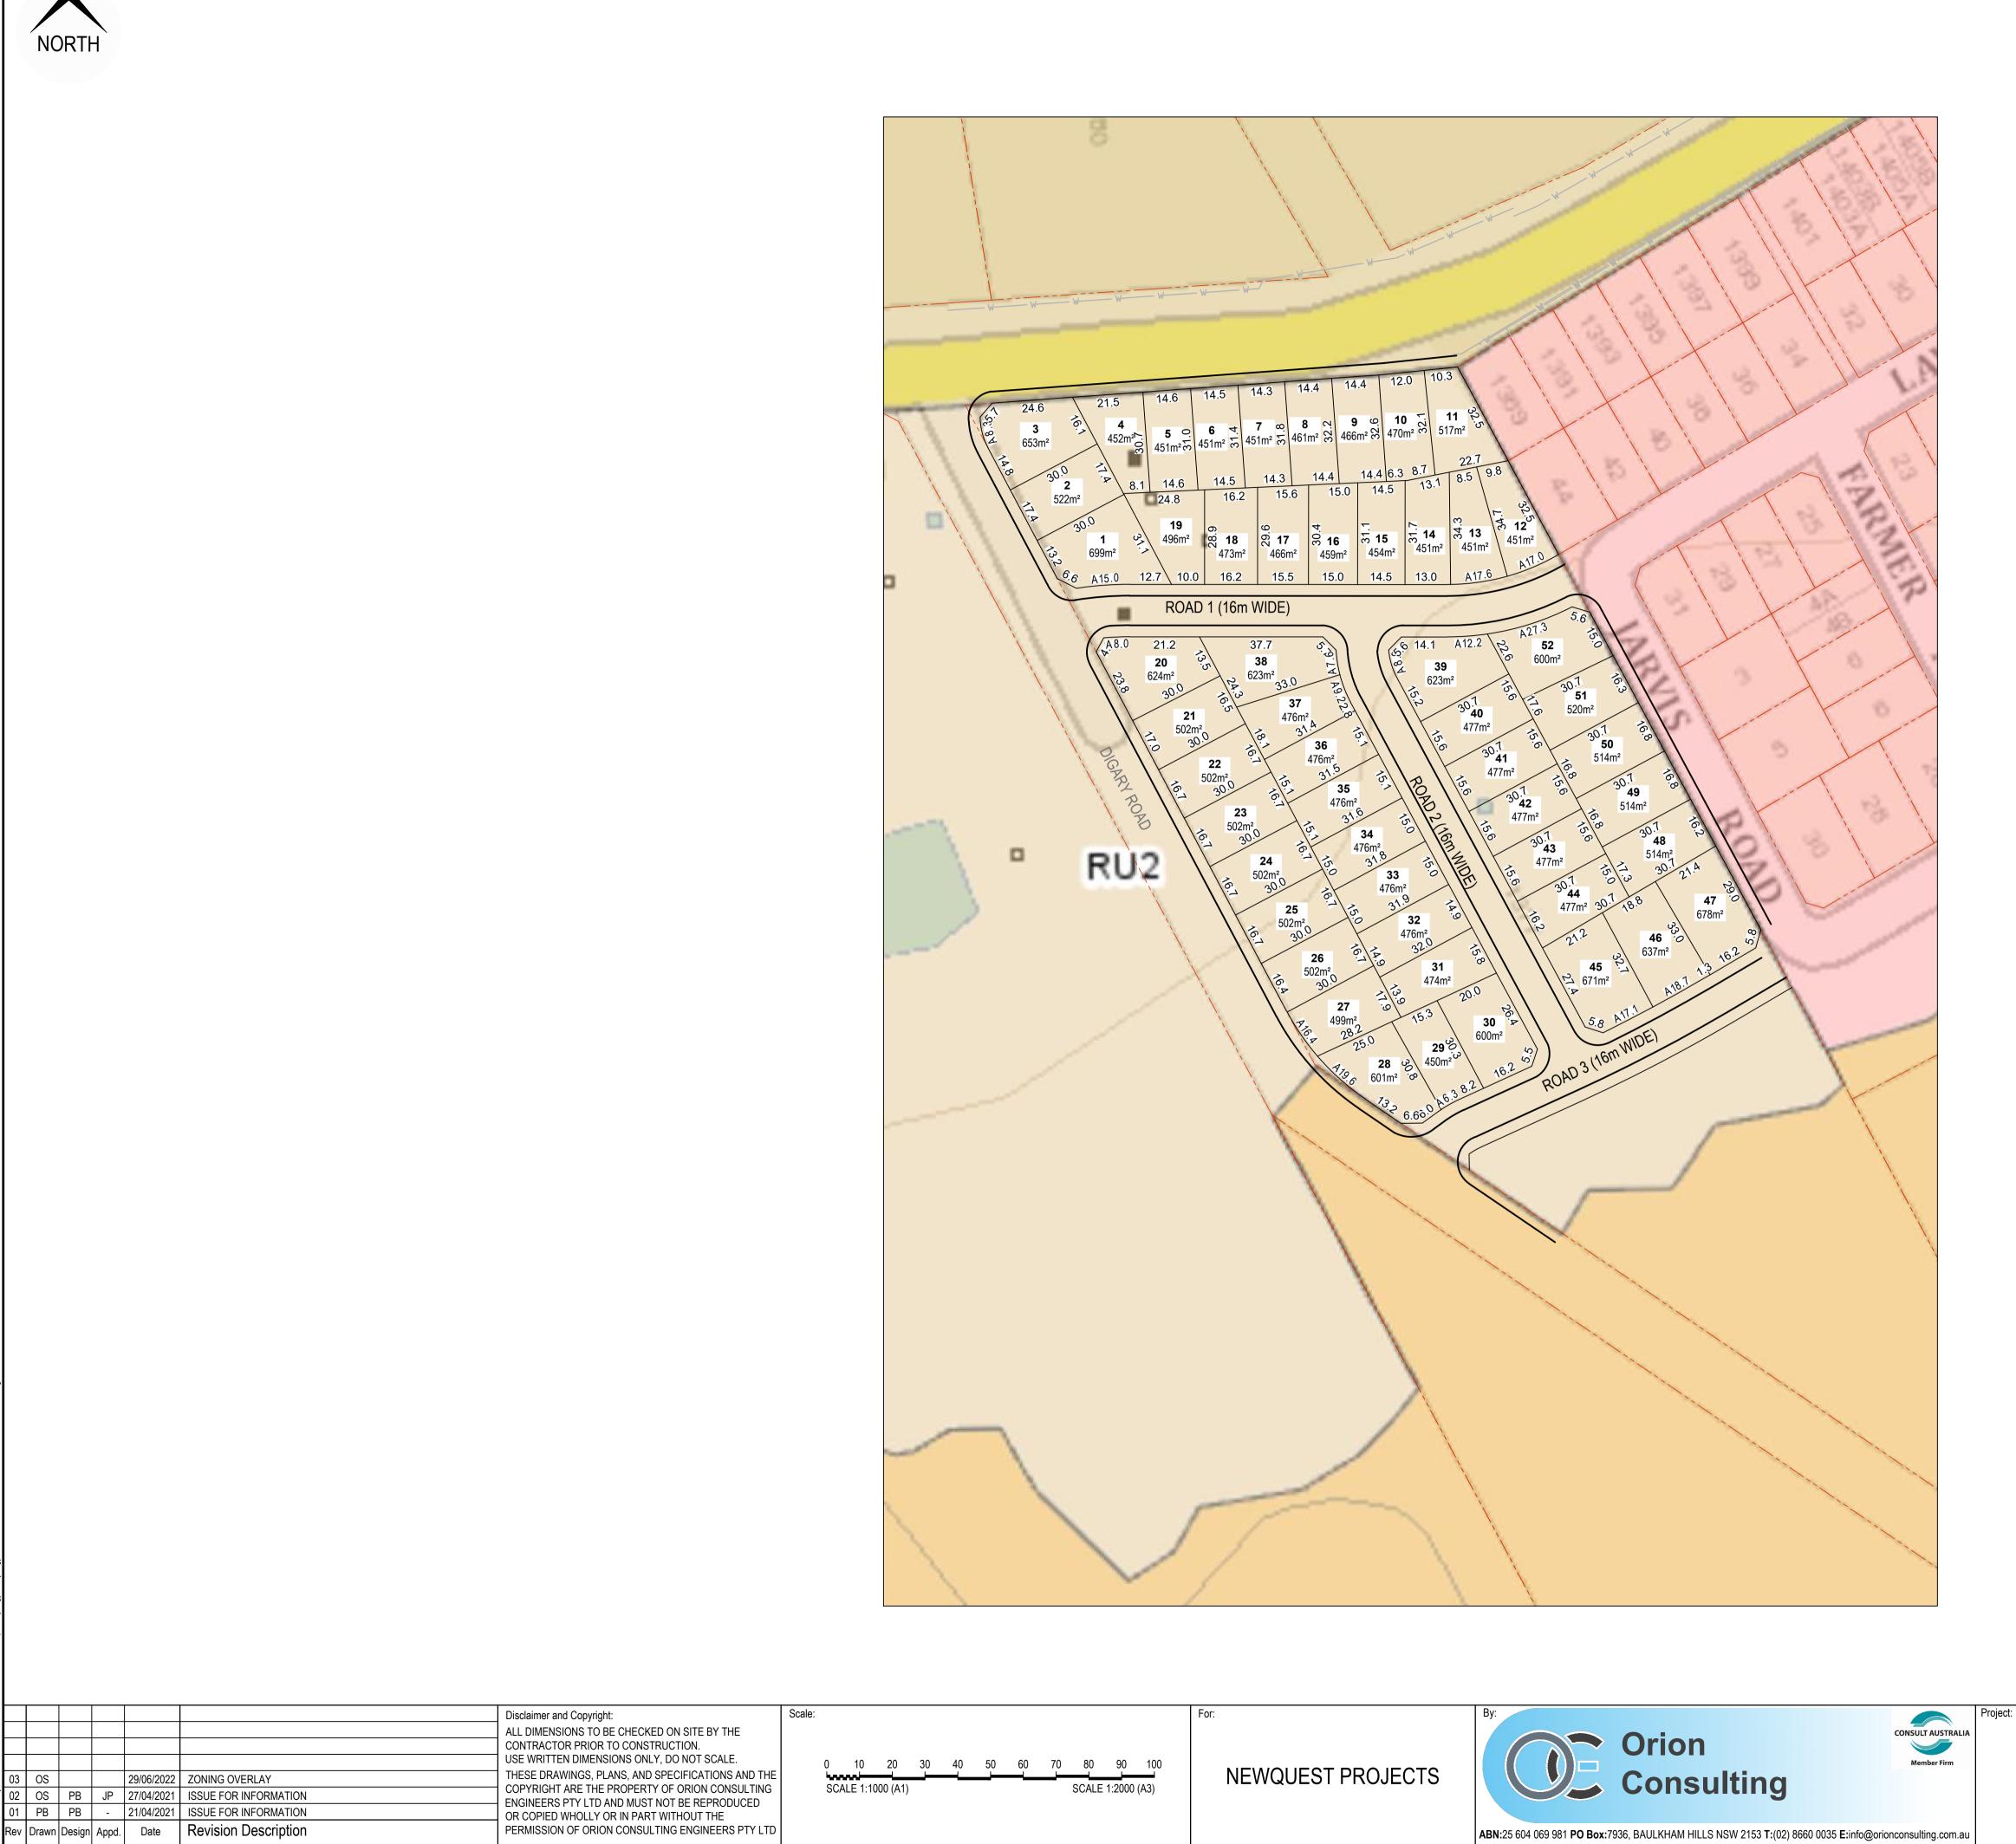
depicts the extent of the site overlain on an aerial photograph of the locality. Figure 2 depicts the Concept Plan for the Planning Proposal within the Subject Site.
